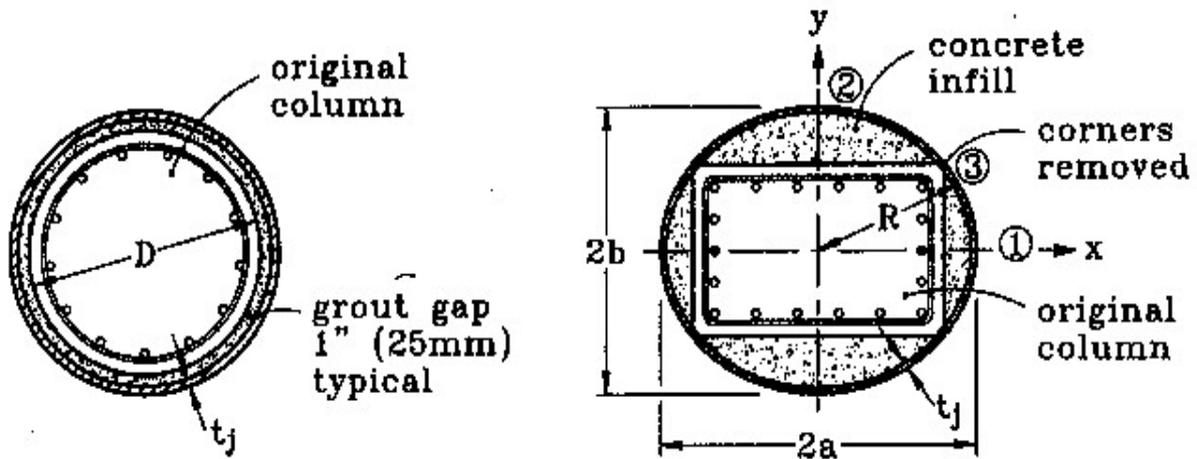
Steel jacketed columns (a) circular, (b) rectangular with elliptical jacket [Priestley et al. (1996)]
